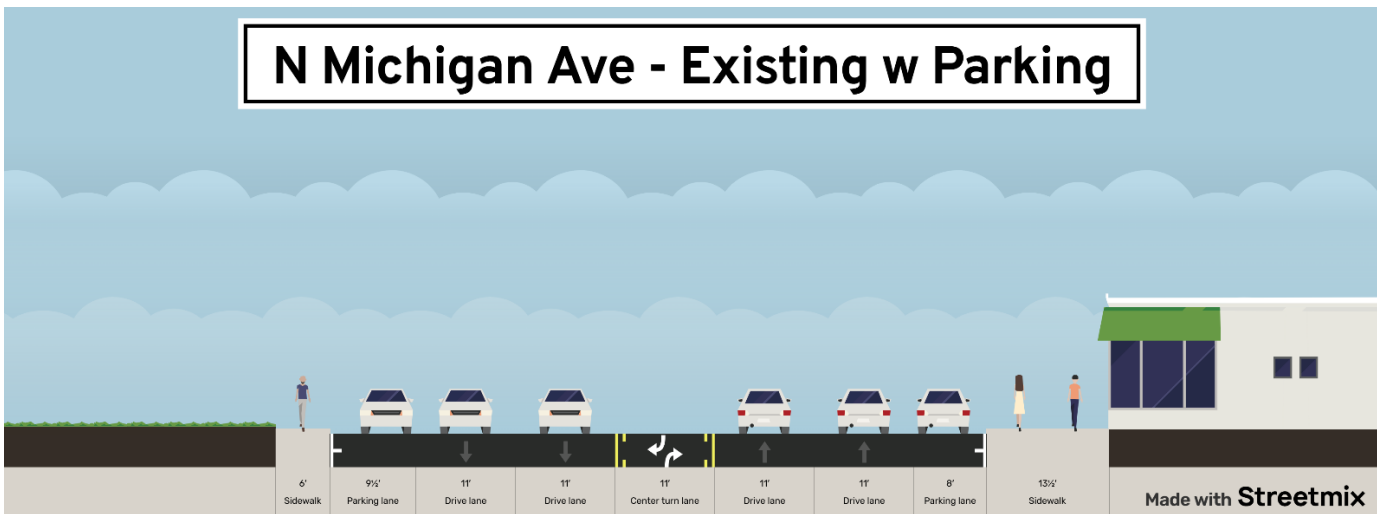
Existing Cross Section 2 - Michigan Ave from Adams St to Hancock St
